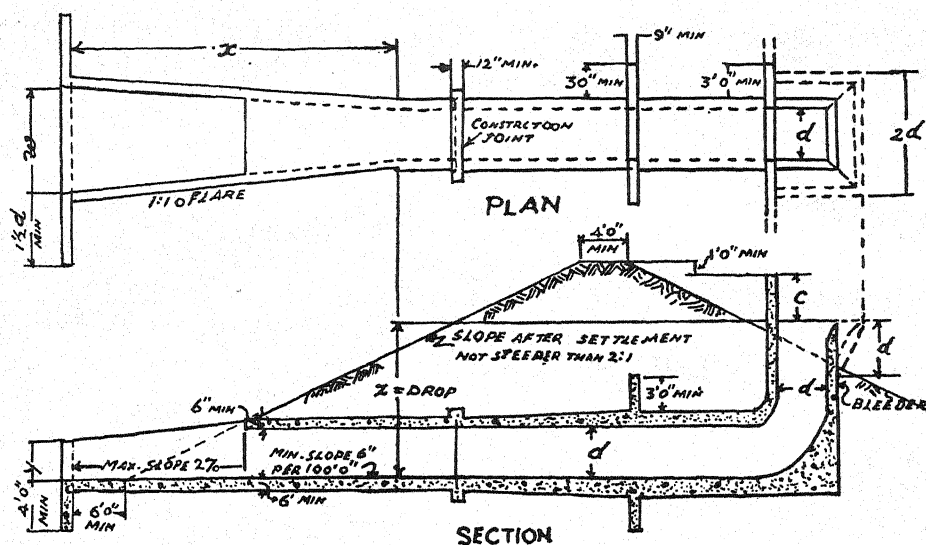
SKETCH OF A DROP-INLET SOIL-SAVING DAM WITH SQUARE CULVERT
